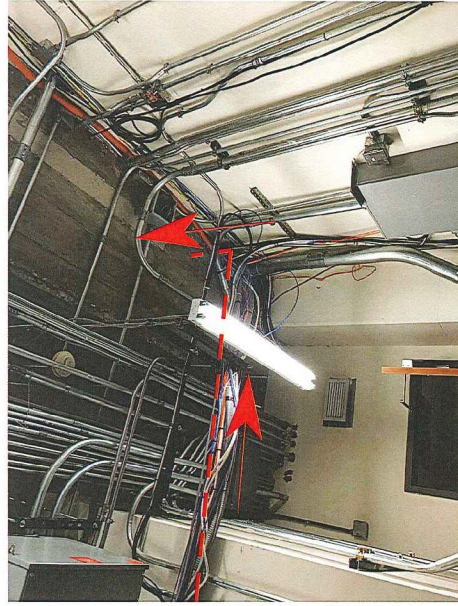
PHOTO: FROM ELECTRICAL/TELEPHONE ROOM TO THE 2ND FLOOR
